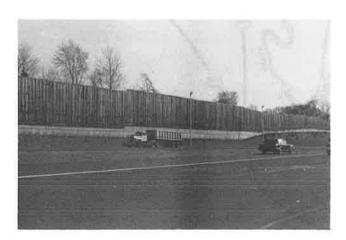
Wooden barrier supported by double wall along I-295/195.
